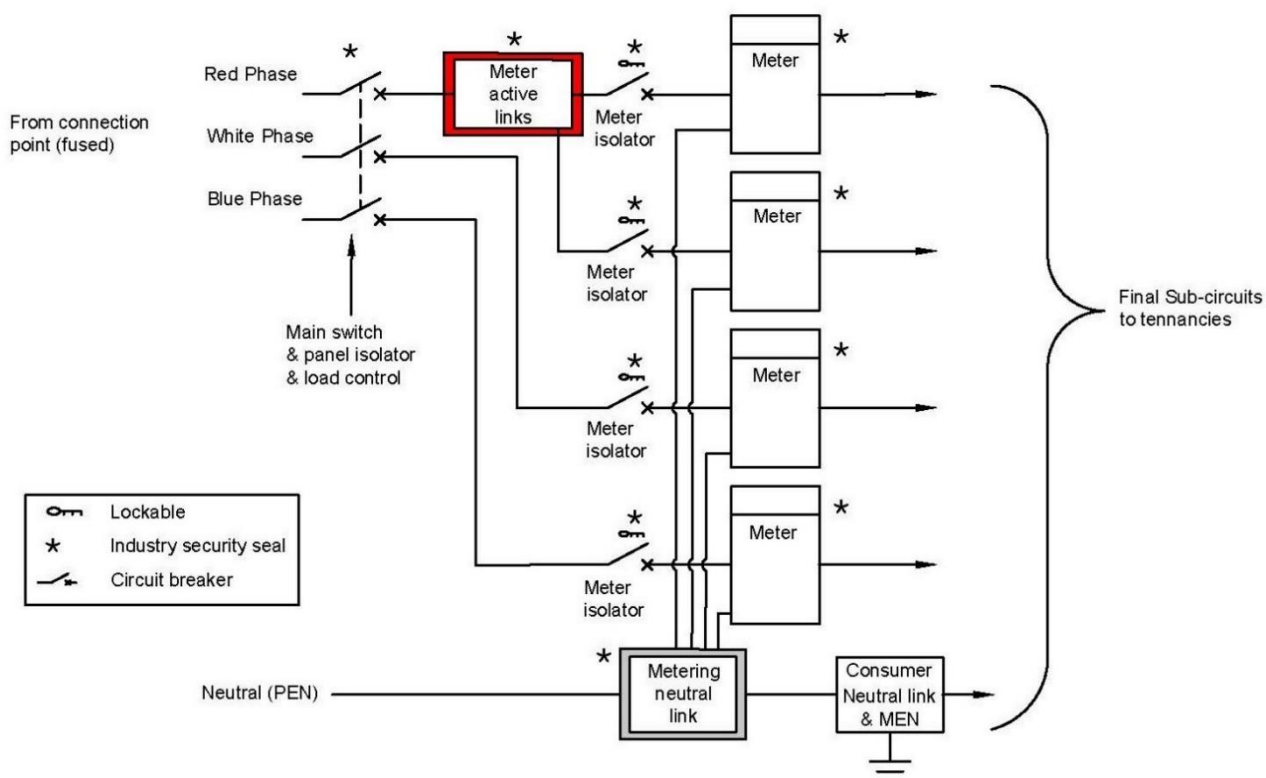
Typical single and multiple revenue meter installations and VPP meter connections
